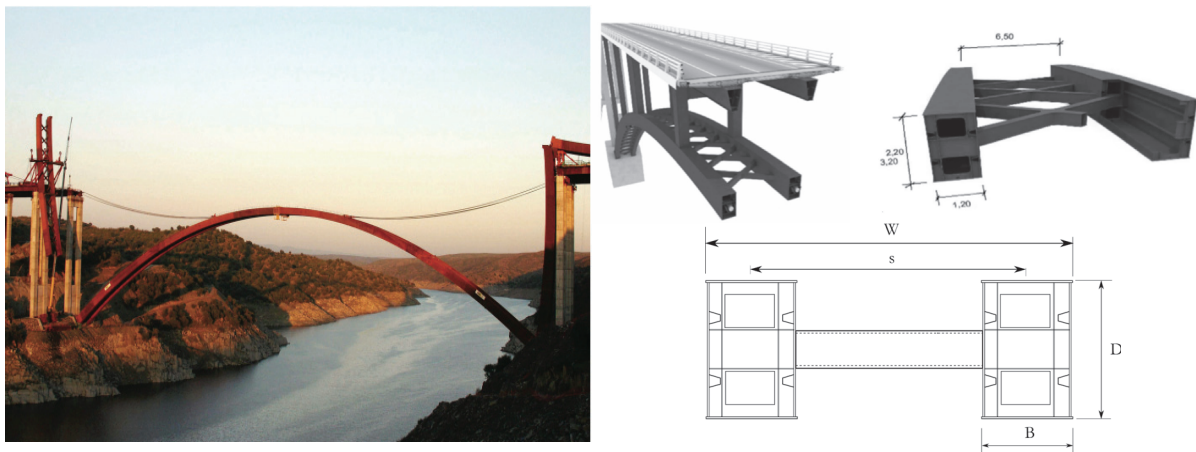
Alconétar bridge during erection (left) and cross-section with main dimensions (right)
